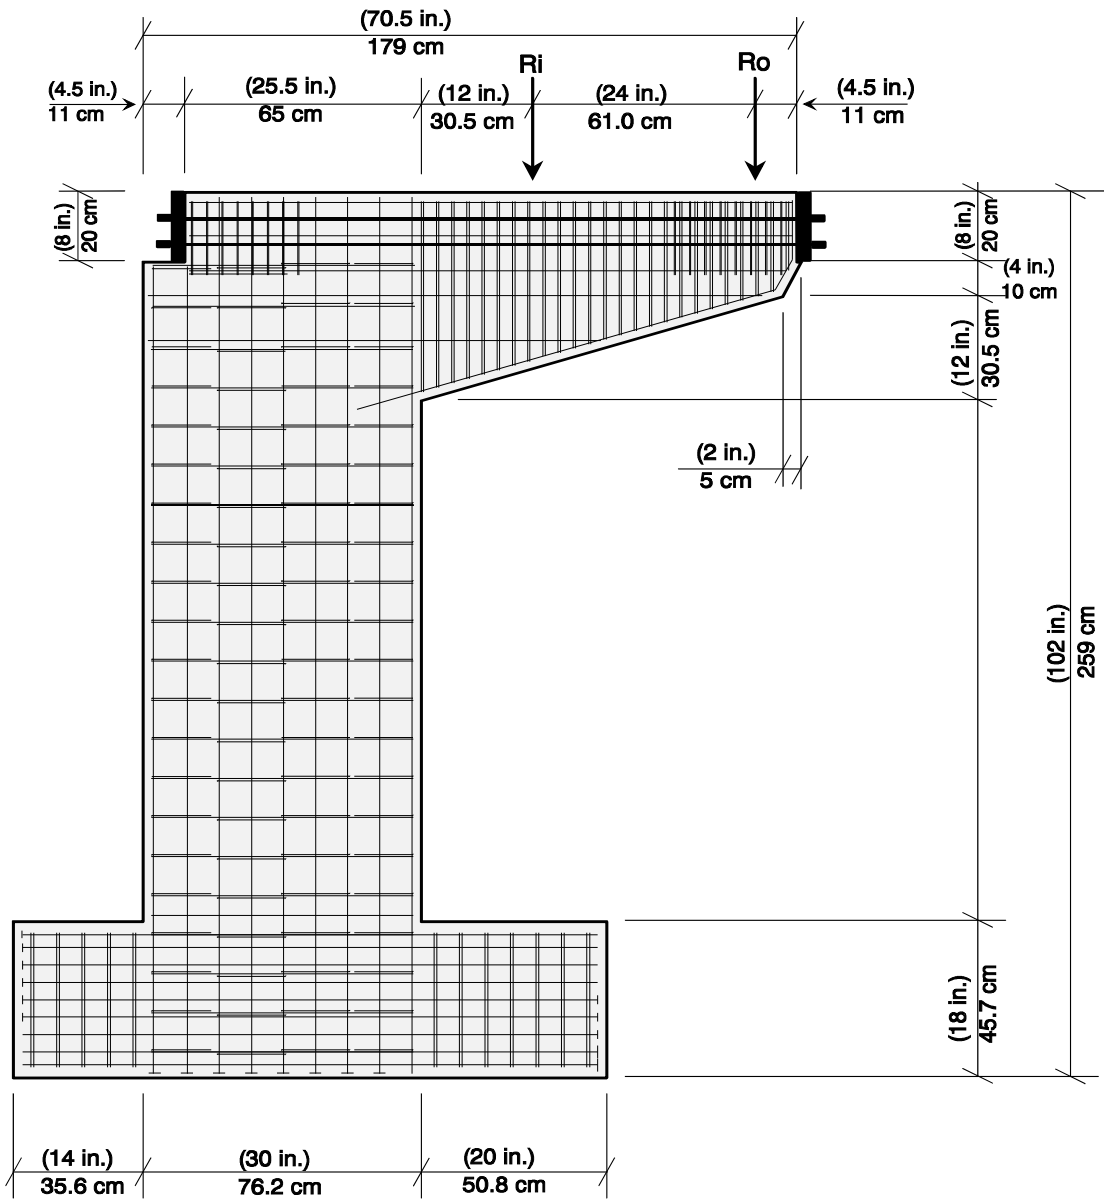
Layout of Reinforcement in Model Bent with Post-Tensioned Overhang
